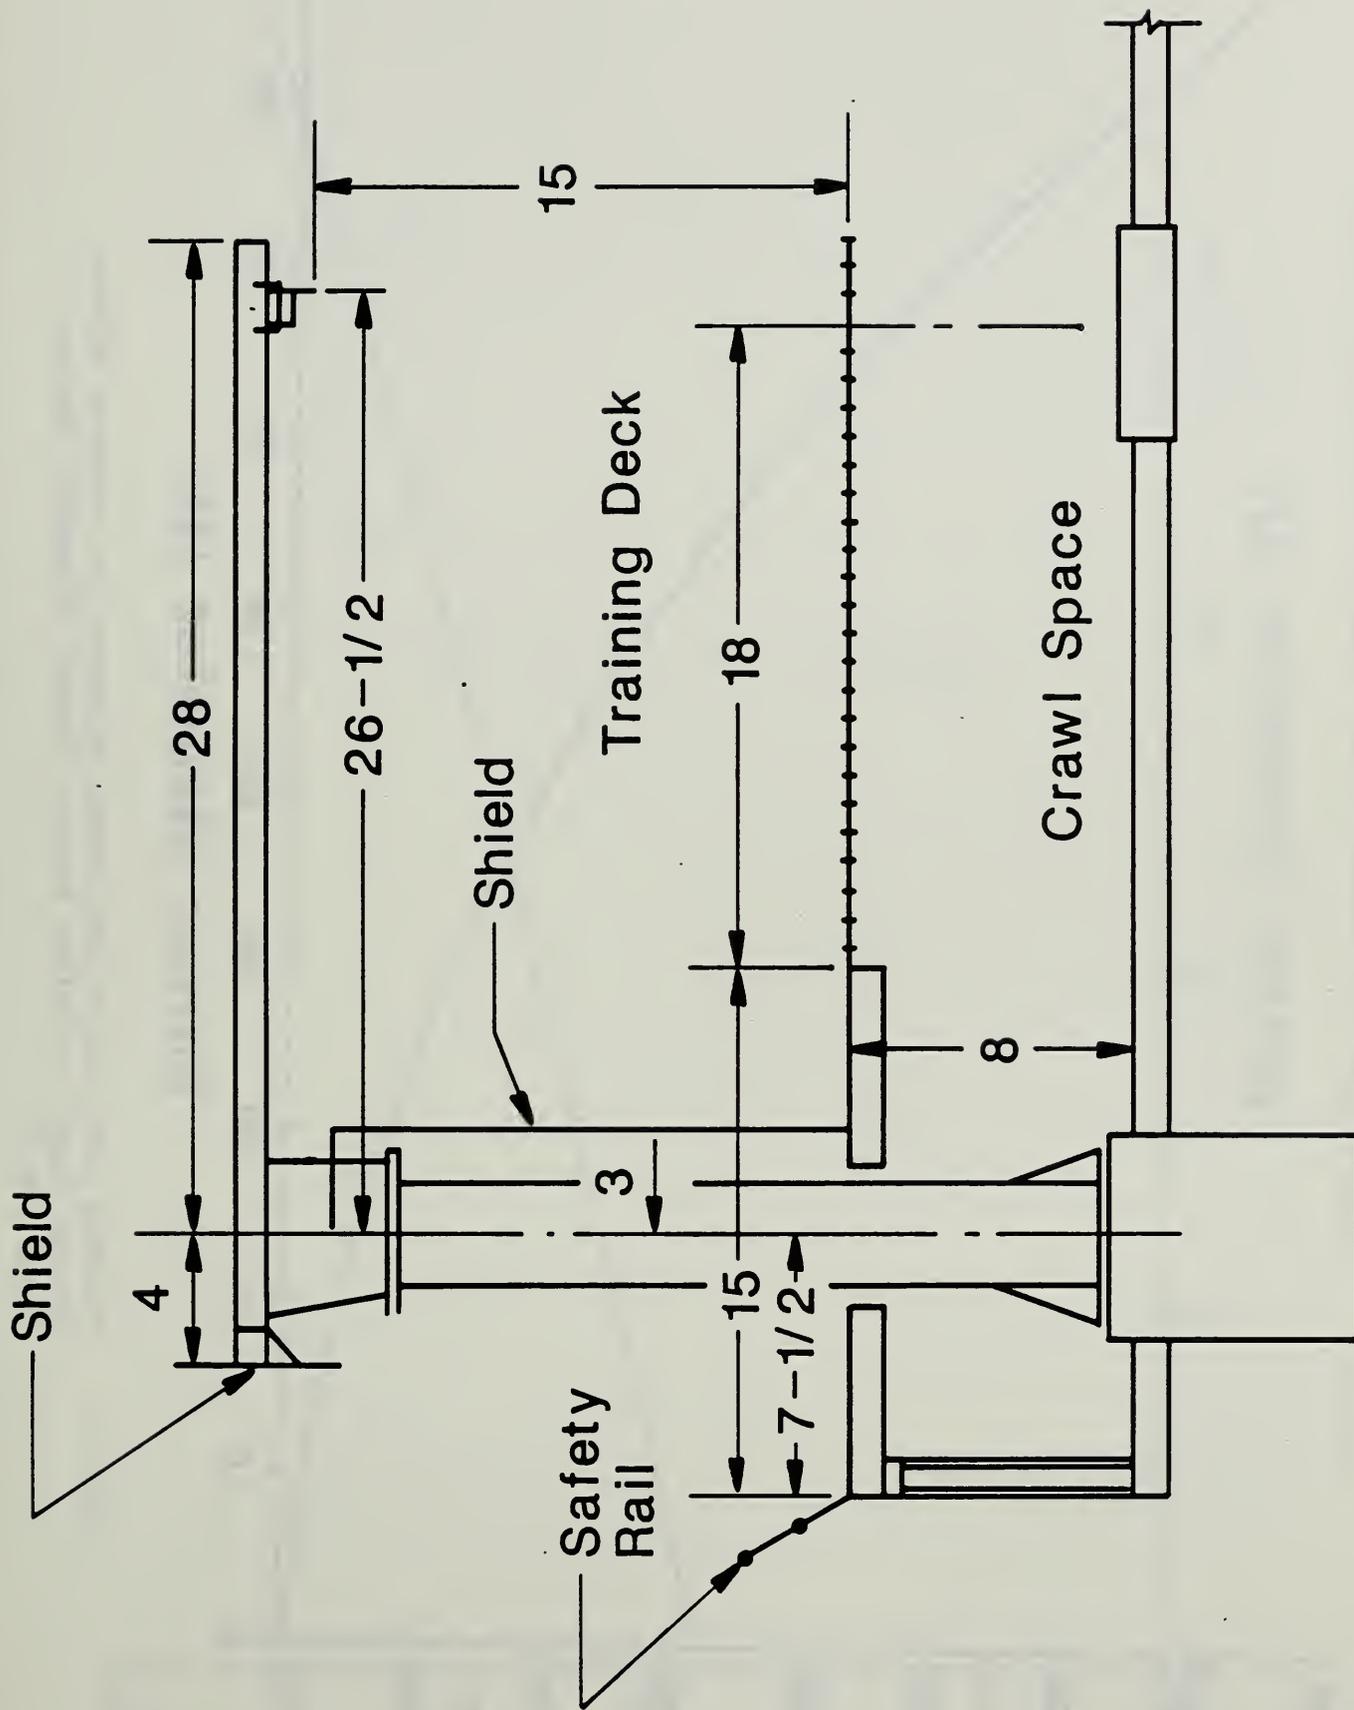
Elevation view of 19F4 trainer facility (all dimensions in feet)
